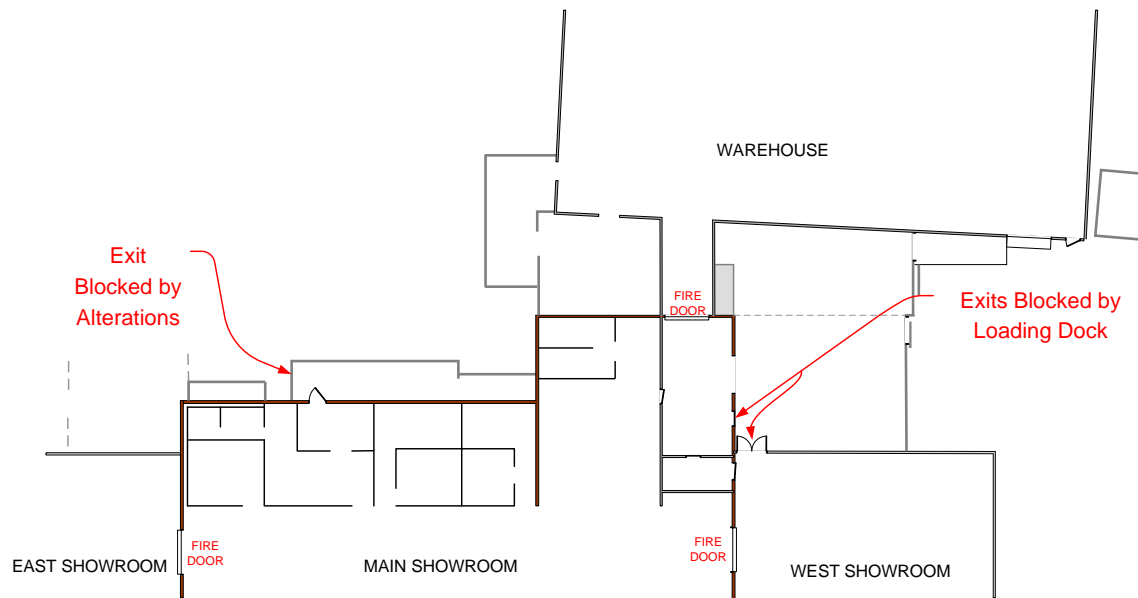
Construction of the loading dock obstructed the egress path from two showroom exits. The construction of offices and modifications to ancillary spaces at the rear of the main showroom obstructed an additional exit.
